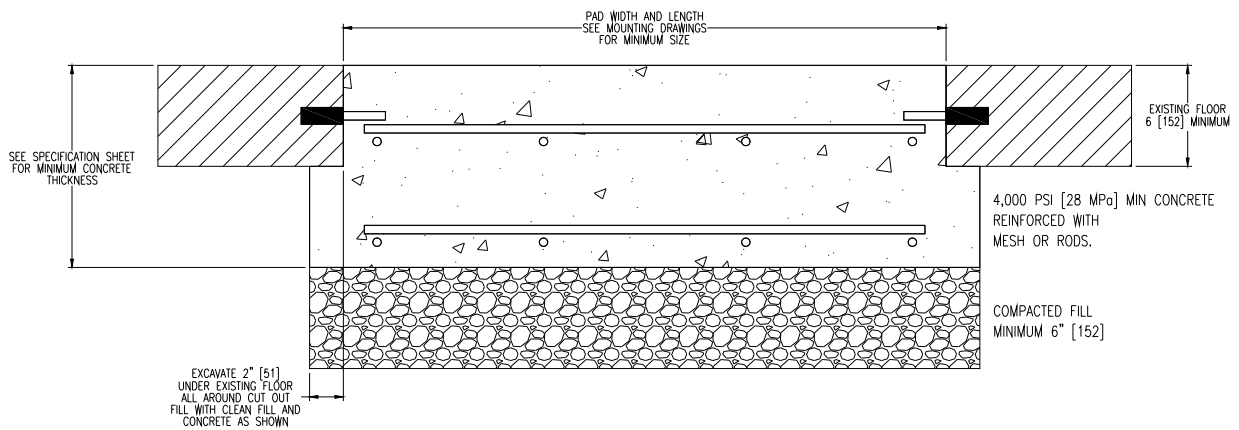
New Pad to Existing Floor(Level with Floor)
